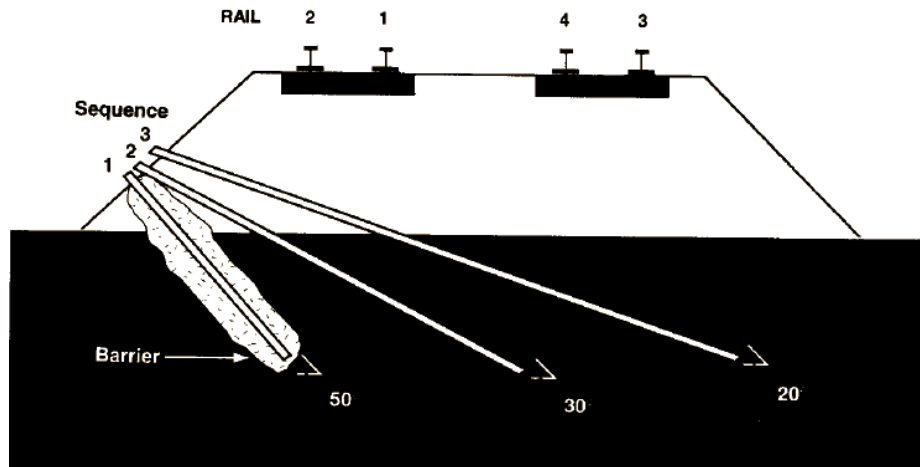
Sleeve Port Pipe Installation Plan (Sluz et al., 2003)
